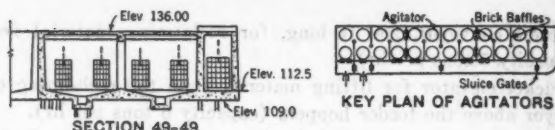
PLAN AND DETAILS OF MIXING CHAMBERS
